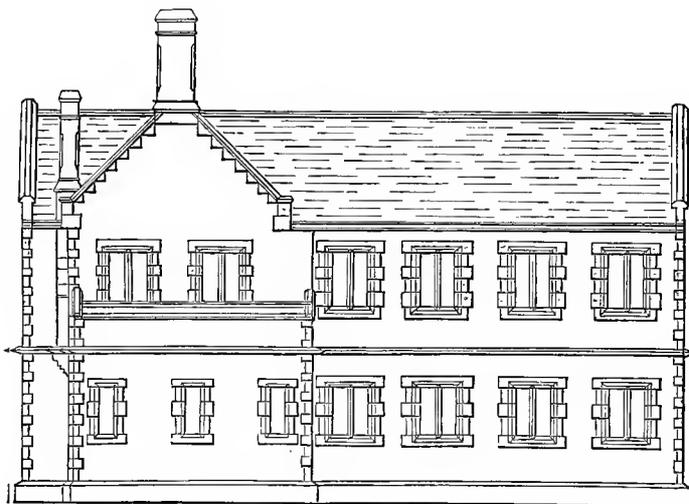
Back elevation of farmhouse—scale in Plate VIII.
